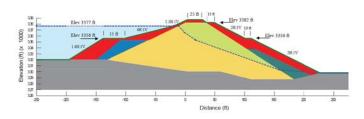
Buttress Configuration at Transition Section (Cross Section A-A').
